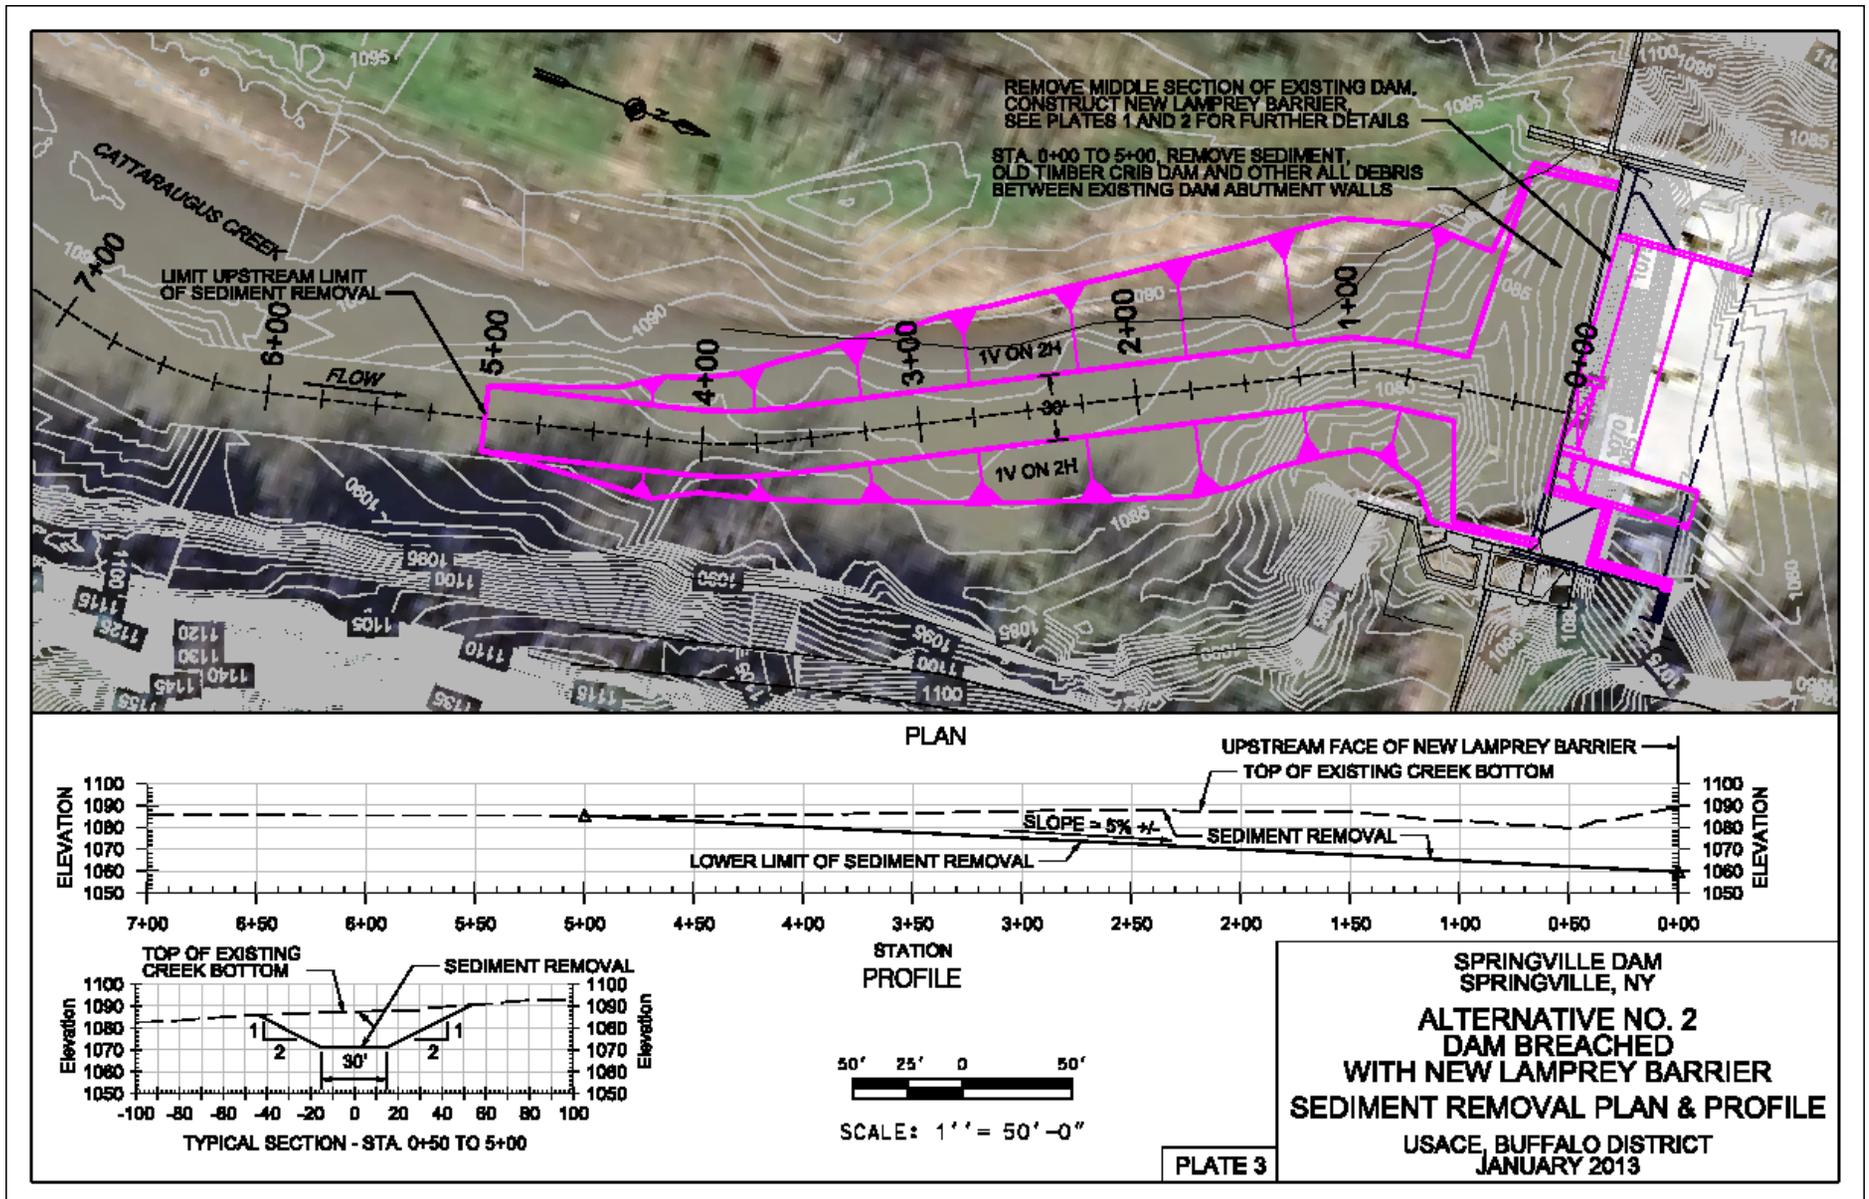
Sediment Removal Plan and Profile on upstream side of Springville Dam for Alternative #2 - Dam breach with new lamprey barrier..
